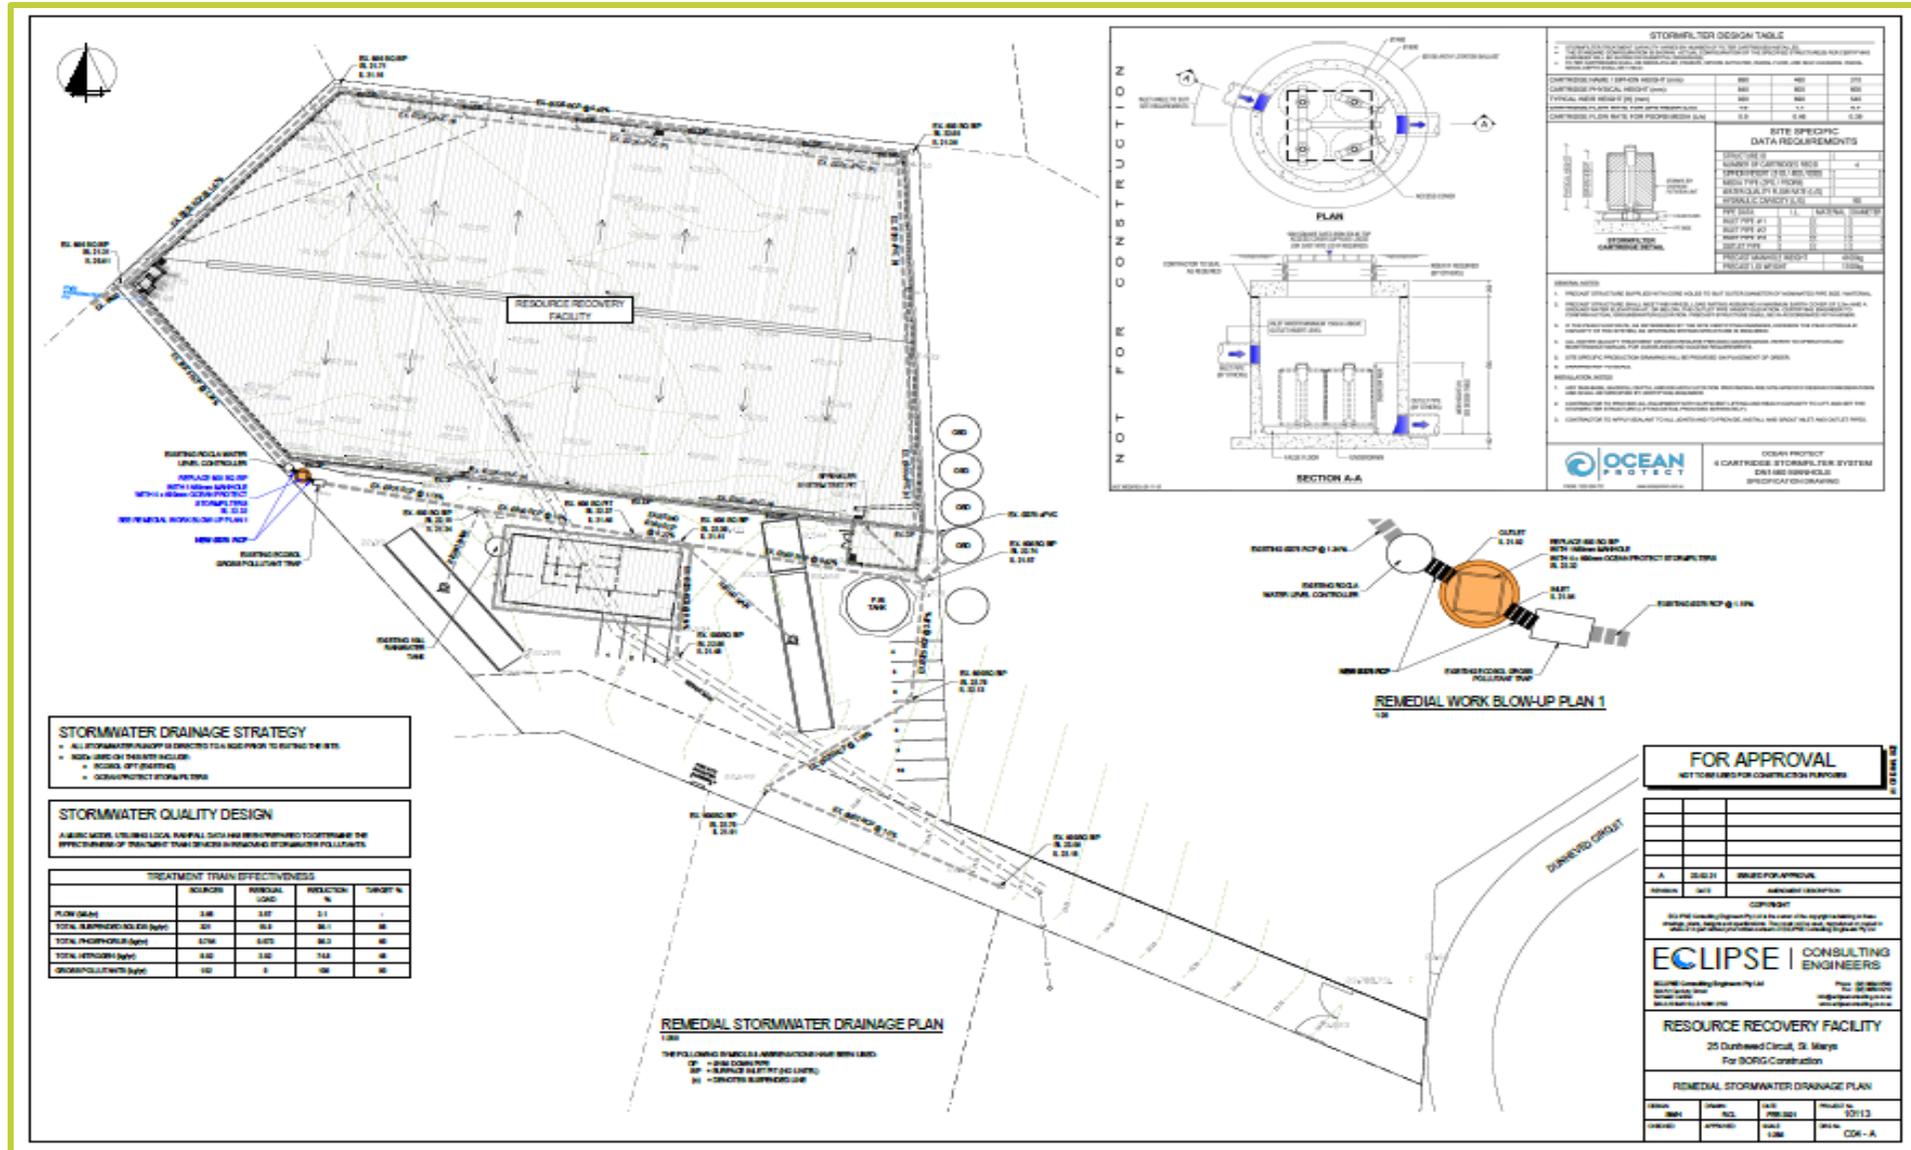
STORMWATER DRAINAGE PLAN FOR THE SITE
